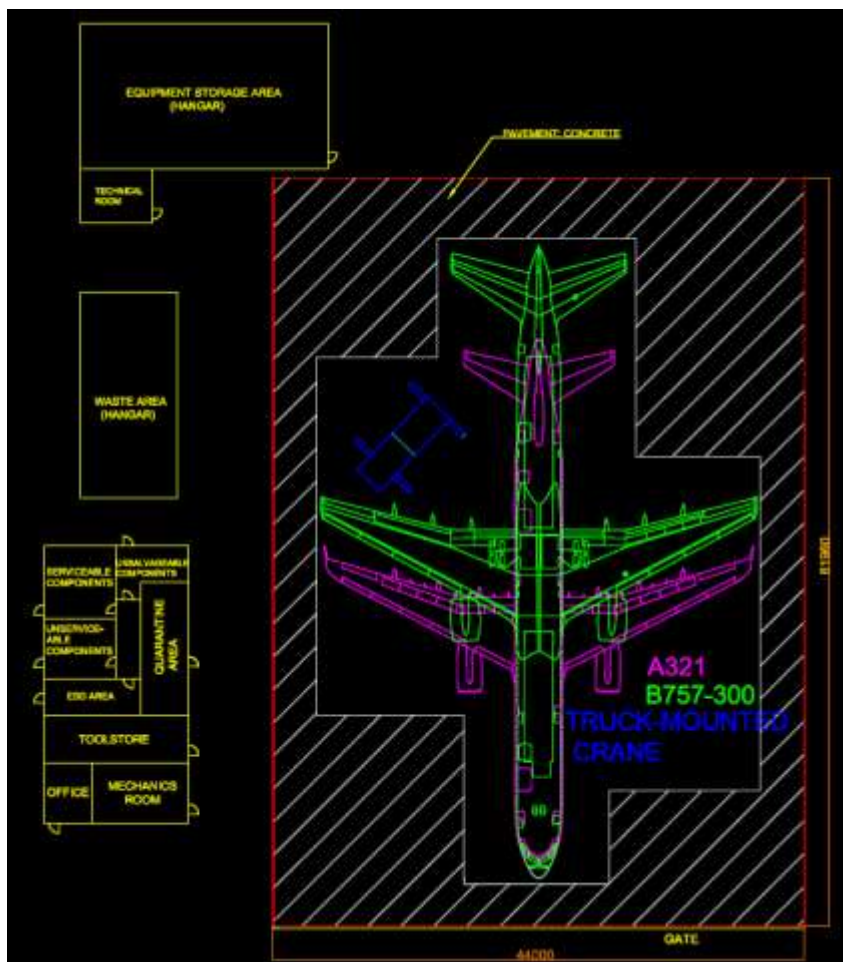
2D plan of aircraft teardown area with necessary support buildings
